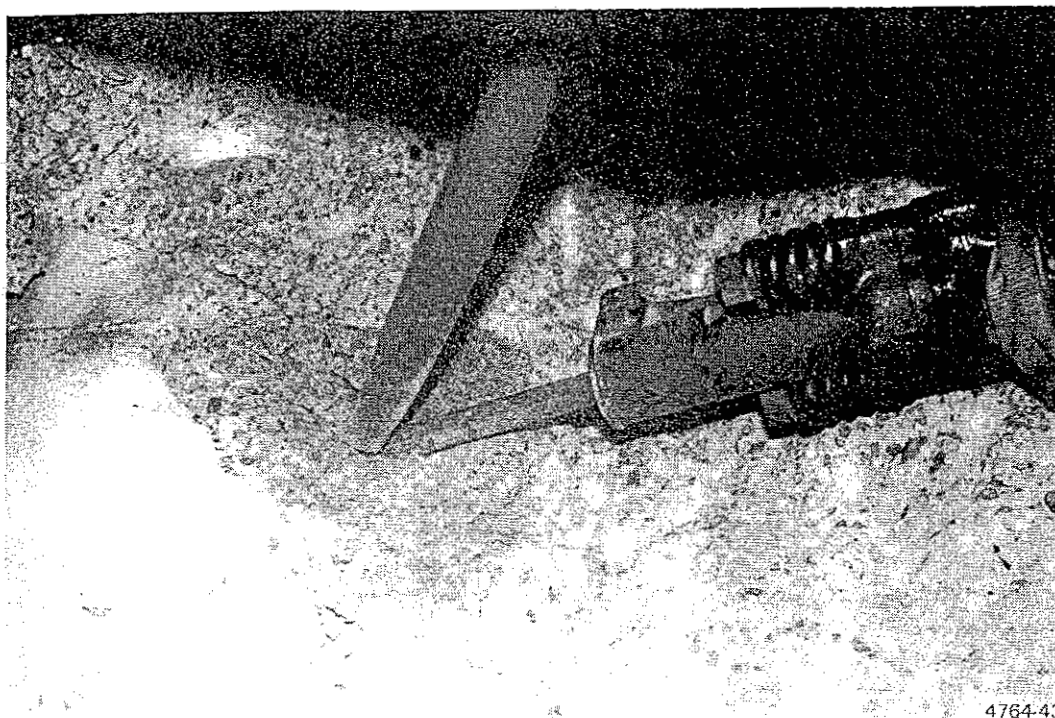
Spalling Concrete From Surface of Exposure Room After Crack Forming
